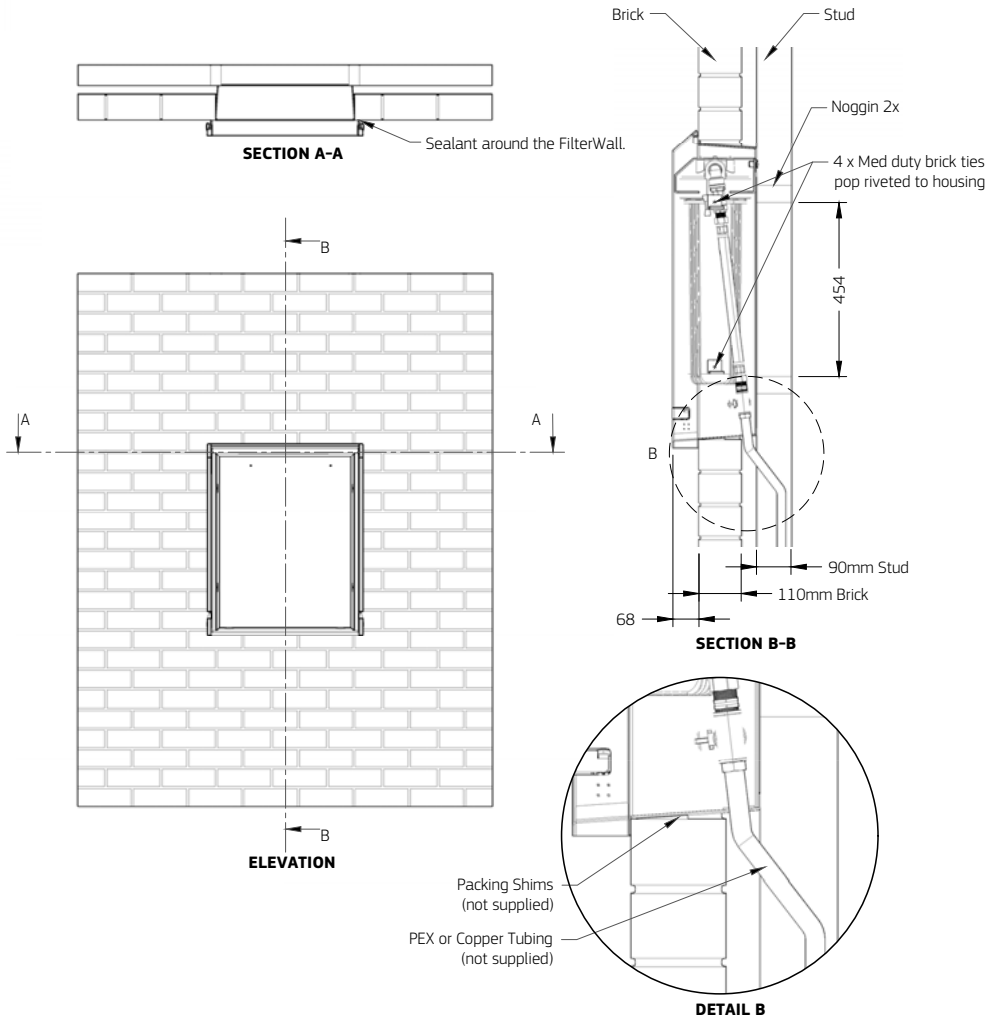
Builder Plans for 110mm Brick, Brick Tie
